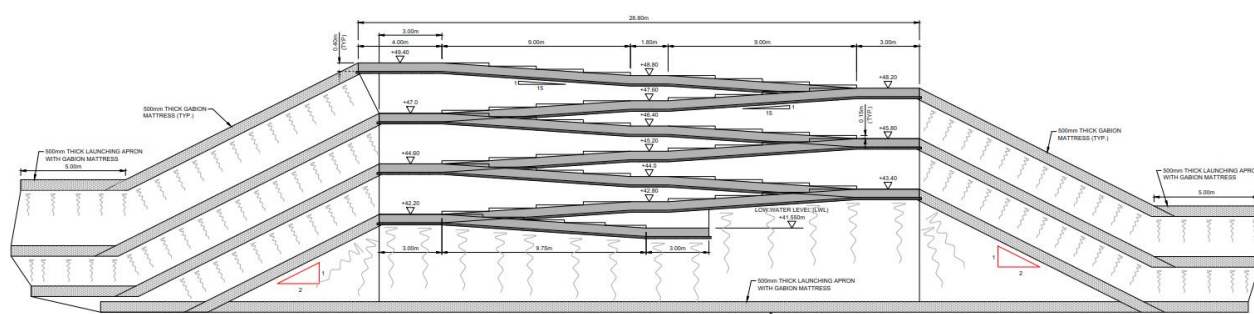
Cross section view of approach ramp at Umananda terminal
